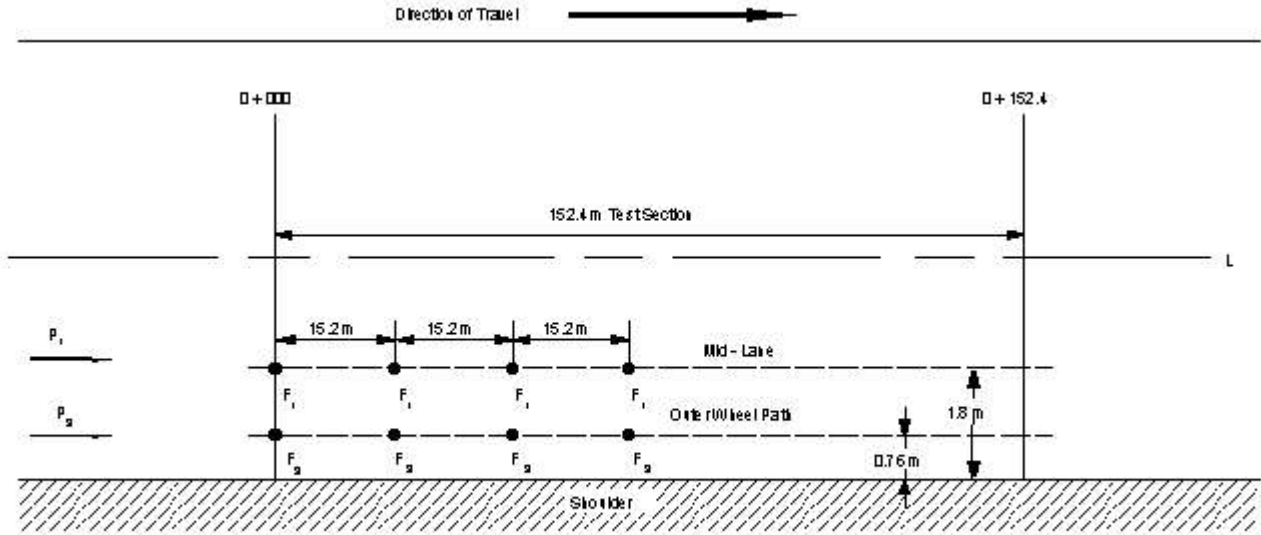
FWD Test Plan for SPS-1 Sections
